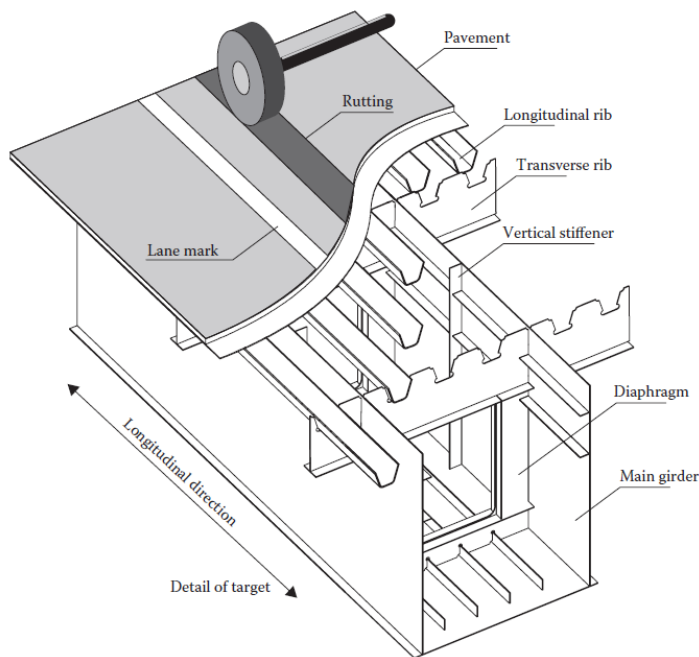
General structure of box section girder with orthotropic steel bridge deck (Chen & Duan 2014).
